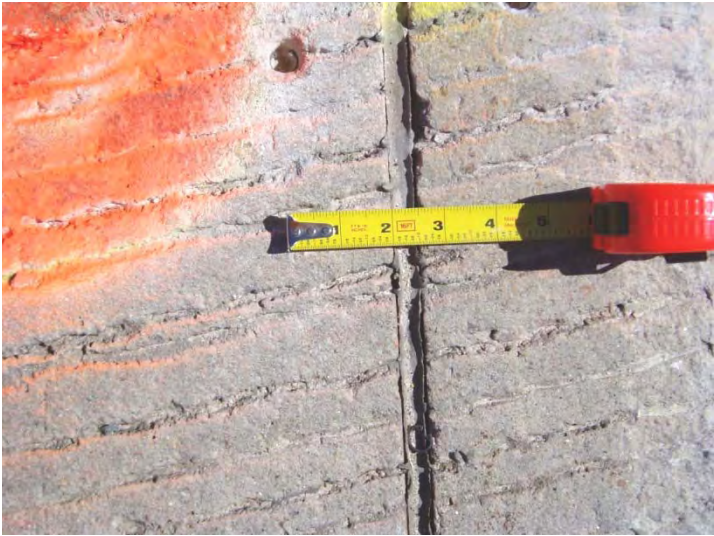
Close-up view of Test Joint A at Gun Club Road site.
